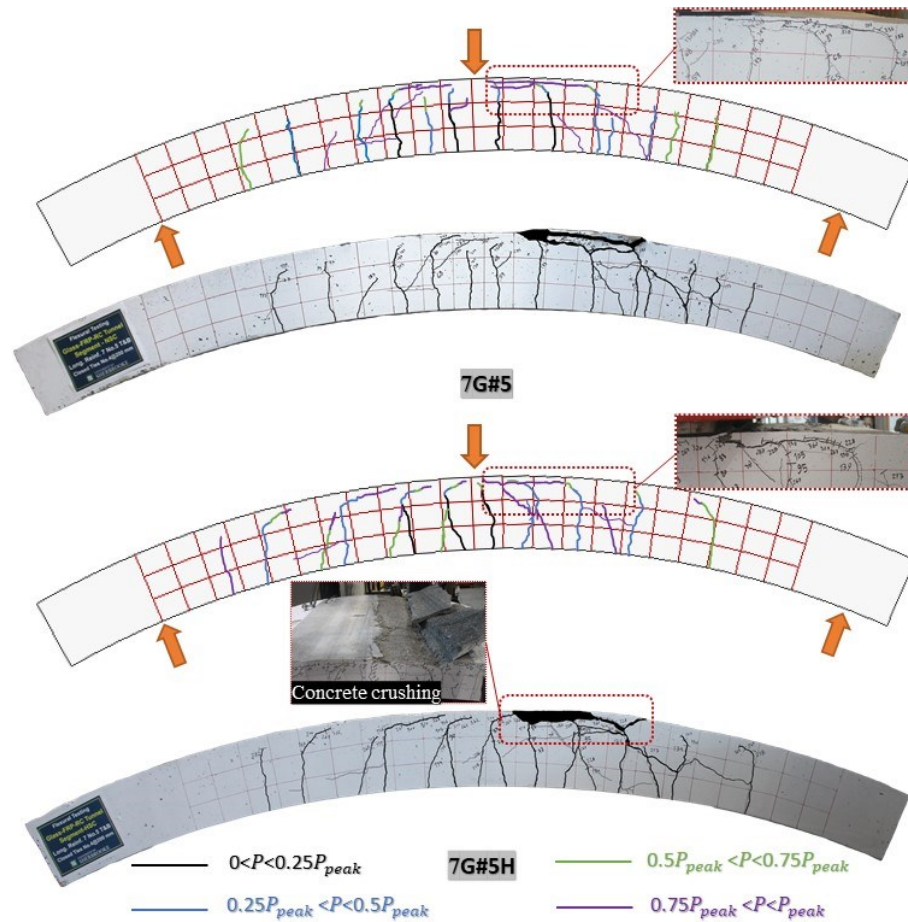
Failure modes and crack patterns of specimens 7G#5 and 7G#5H.
